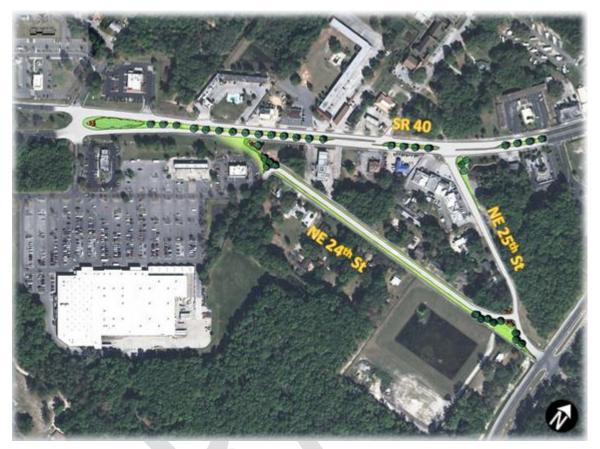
24th Street Driveway Type Connection to NE 25th Street
